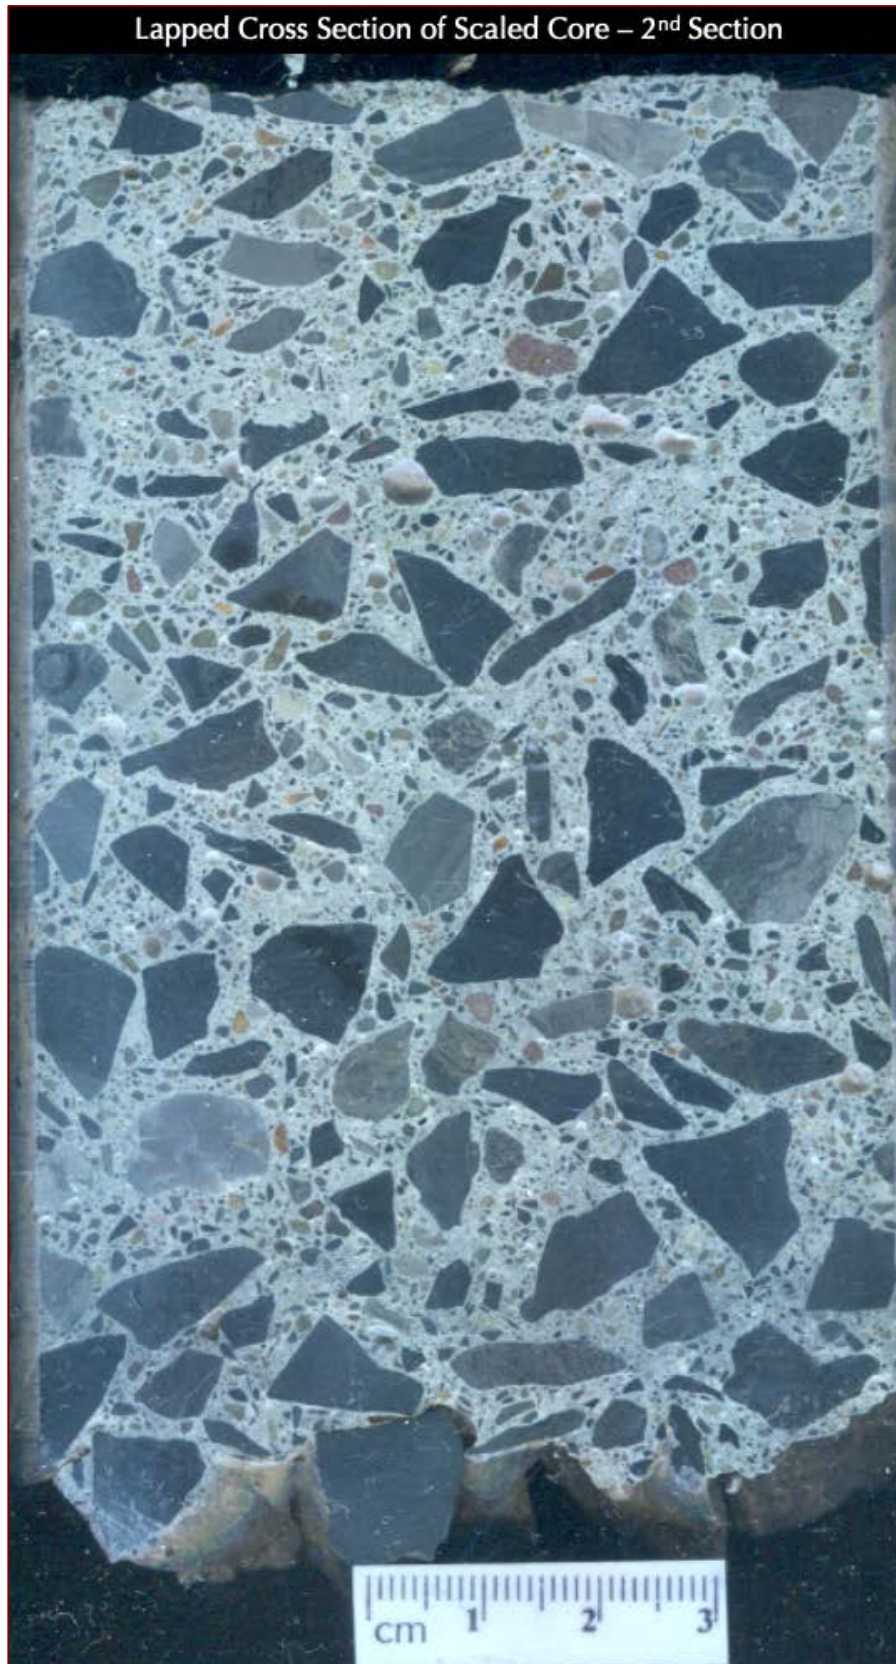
A second lapped cross section of the core from scaled area of driveway showing:
